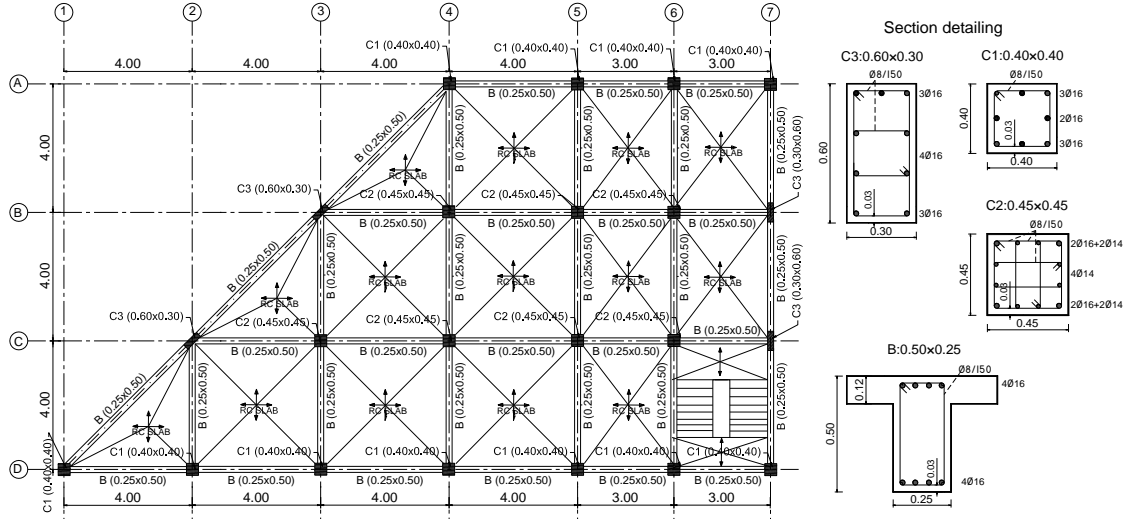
Plan view of a typical story of the 3-Ir, 4-Ir and 5-Ir buildings and design details.
